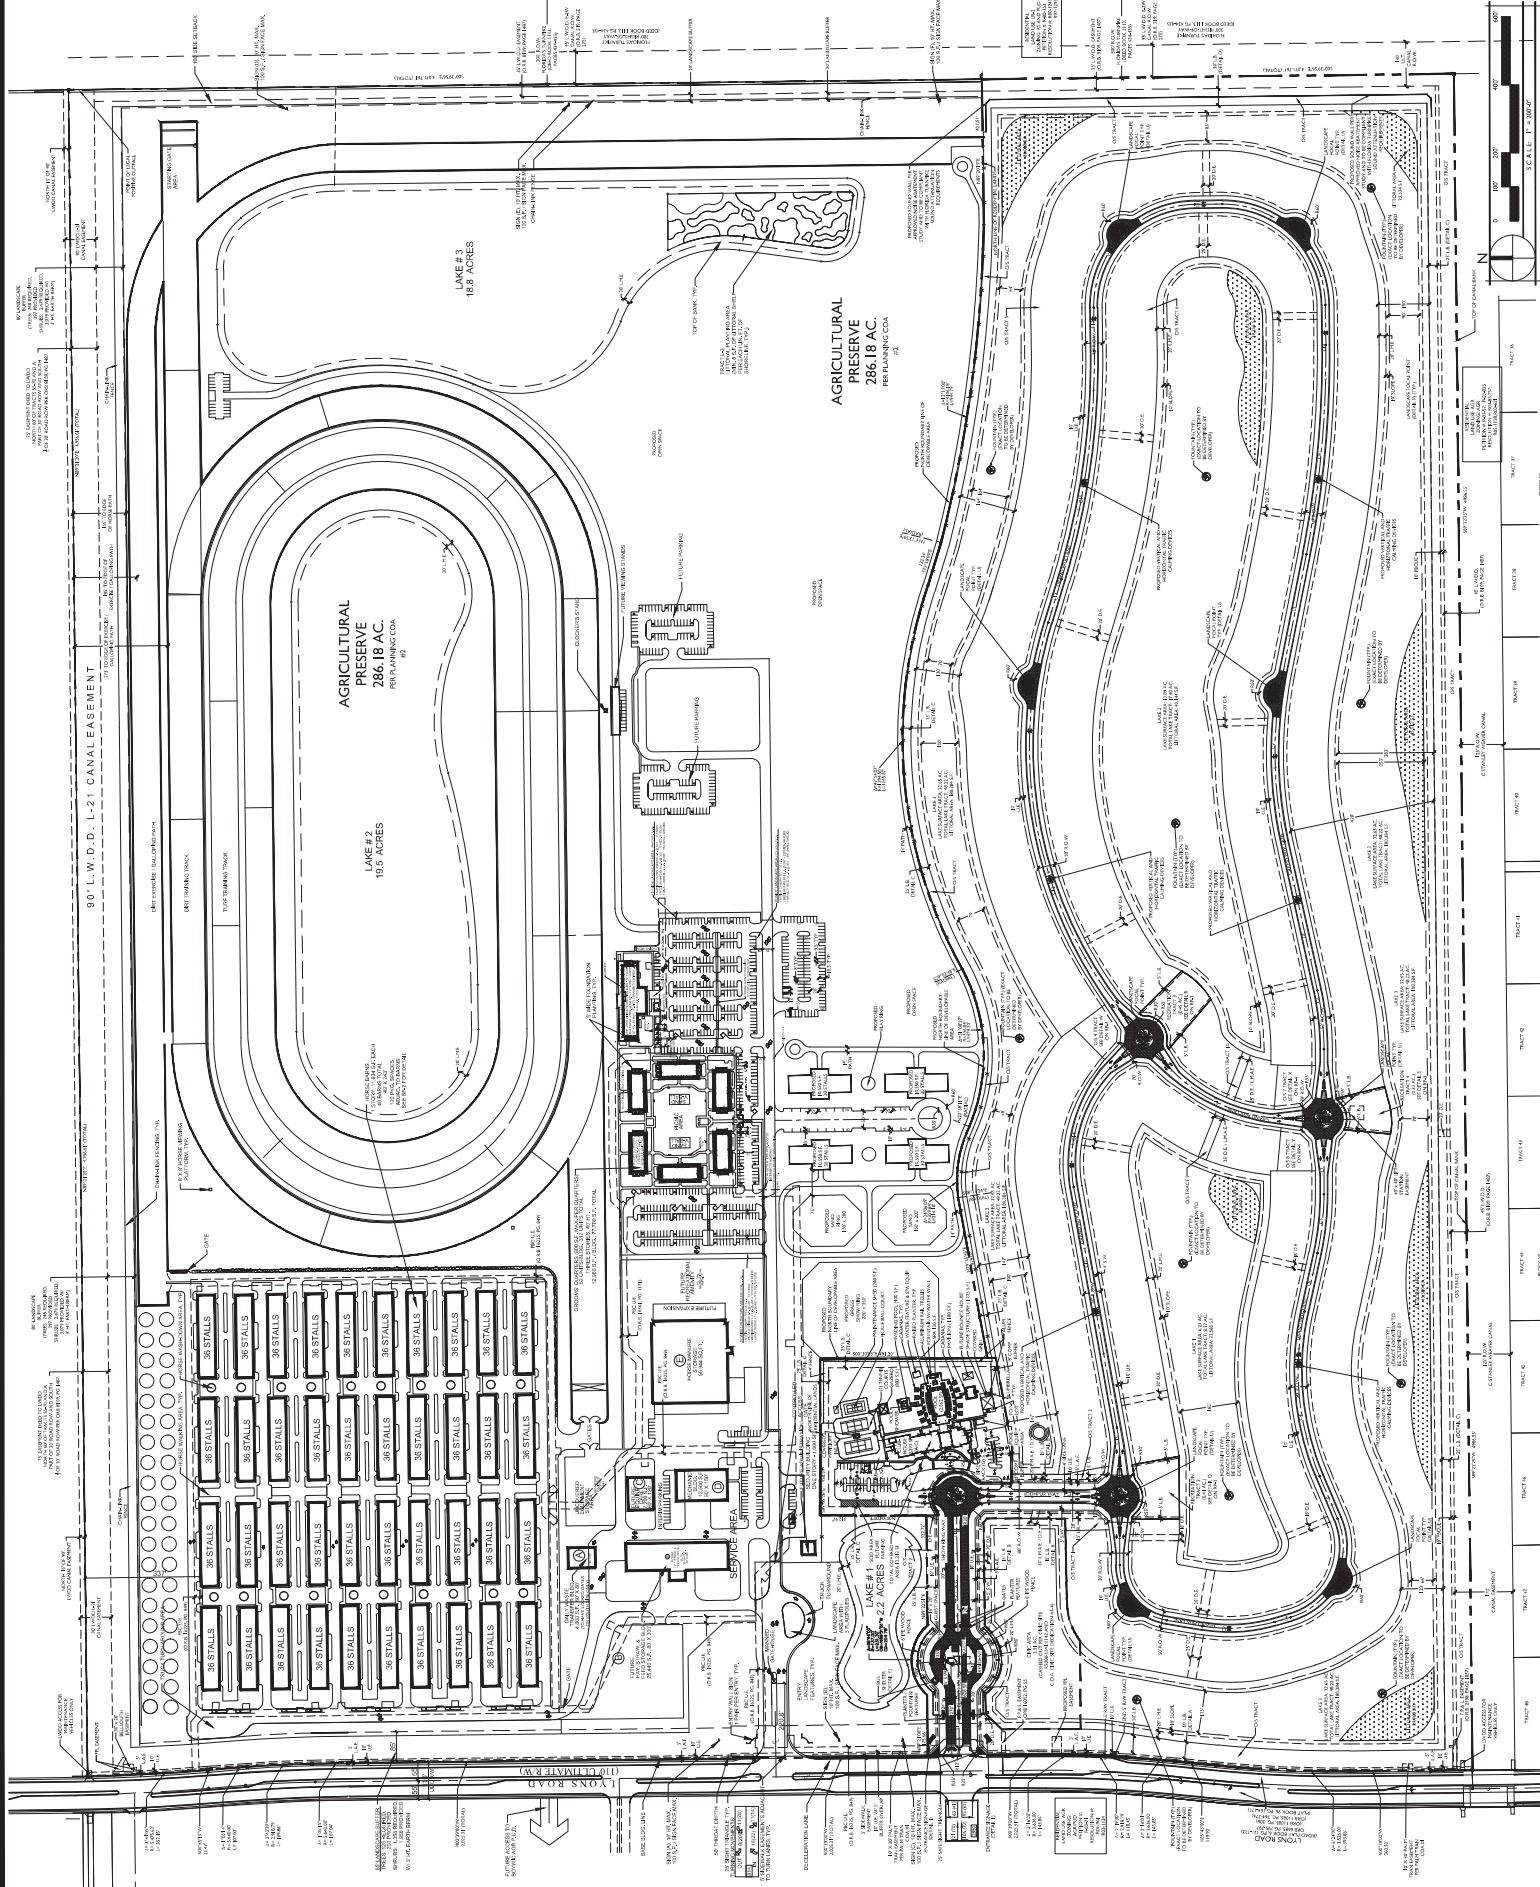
Approved Site Plan dated December 9, 2015
